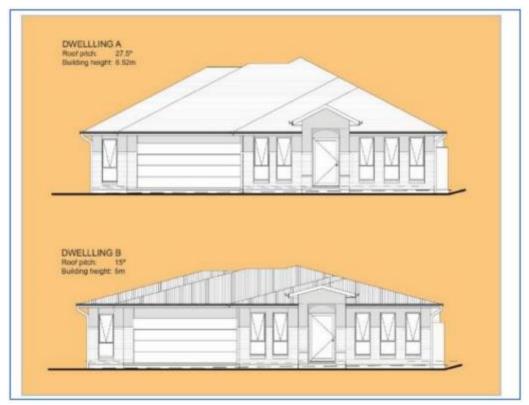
Dwelling roof forms, 15 degree and 27.5 degree roof pitches
